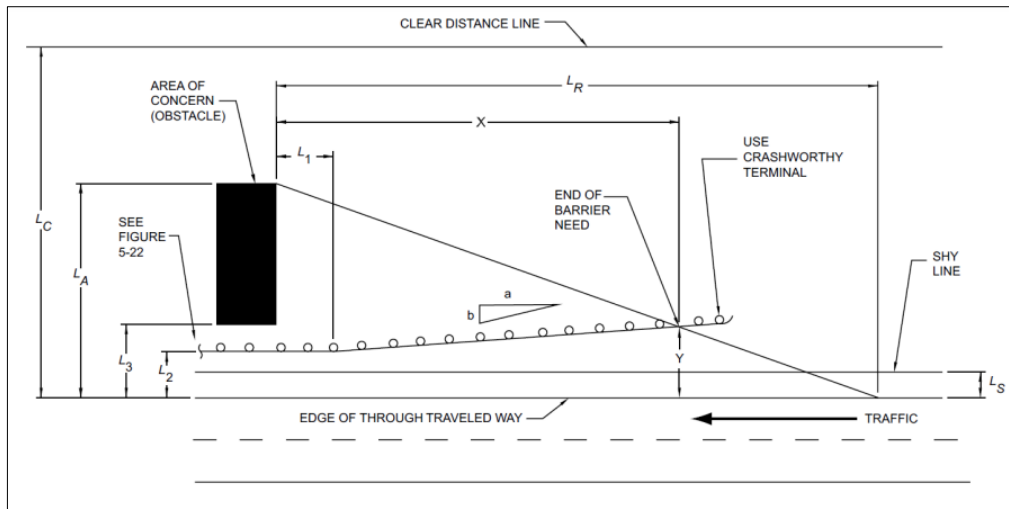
Guardrail Approach Layout (AASHTO, 2011)
